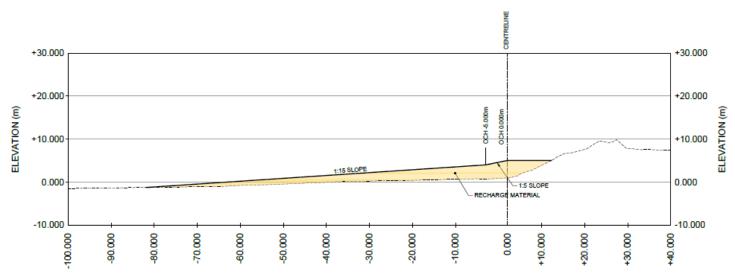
Typical cross section at the Bacton Gas Terminal - Element 1 Terminal
